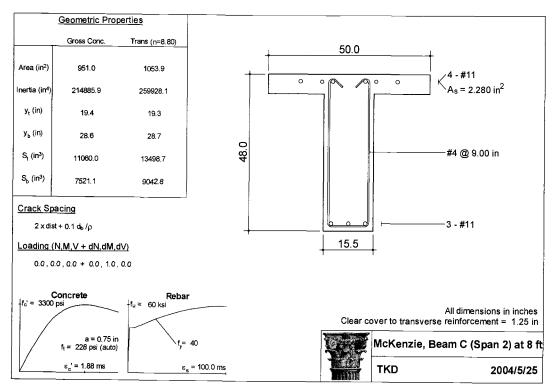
McKenzie R. Bridge; Span 2 at 8 ft. (RESPONSE 2000TM)
